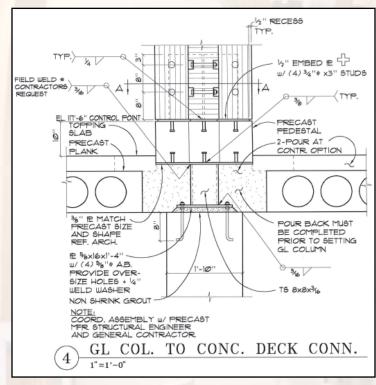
Glulam column connection to concrete deck. Design by KPFF
